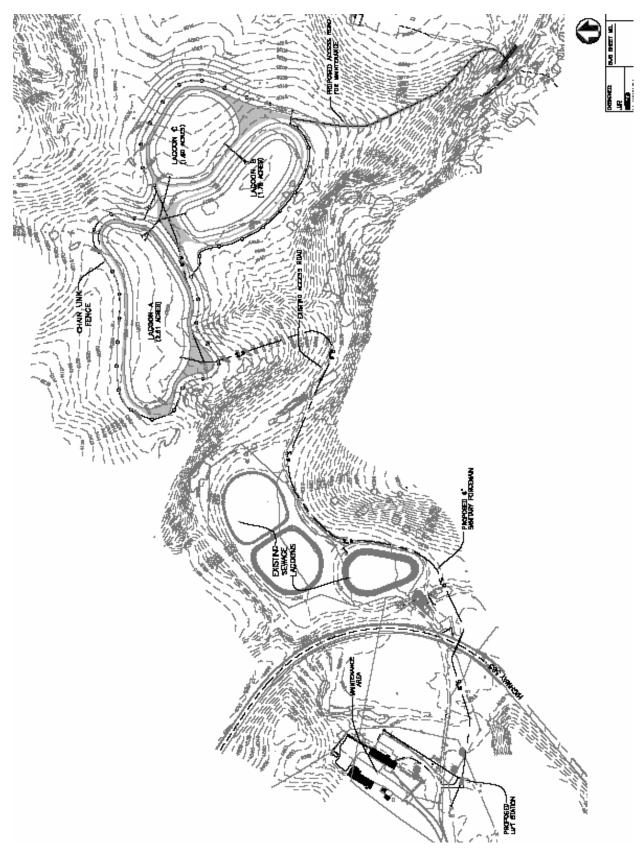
Location of New Wastewater Lagoons under the Selected Alternative
